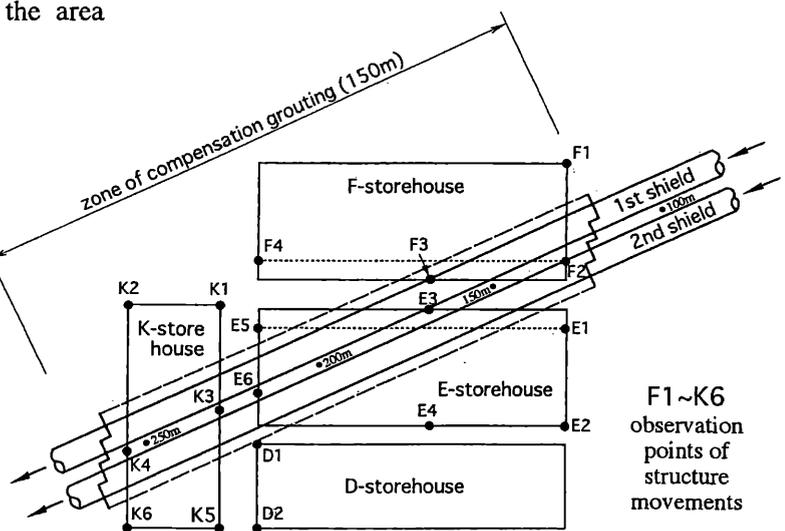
Plan location of two parallel shield tunnels and existing storehouses
